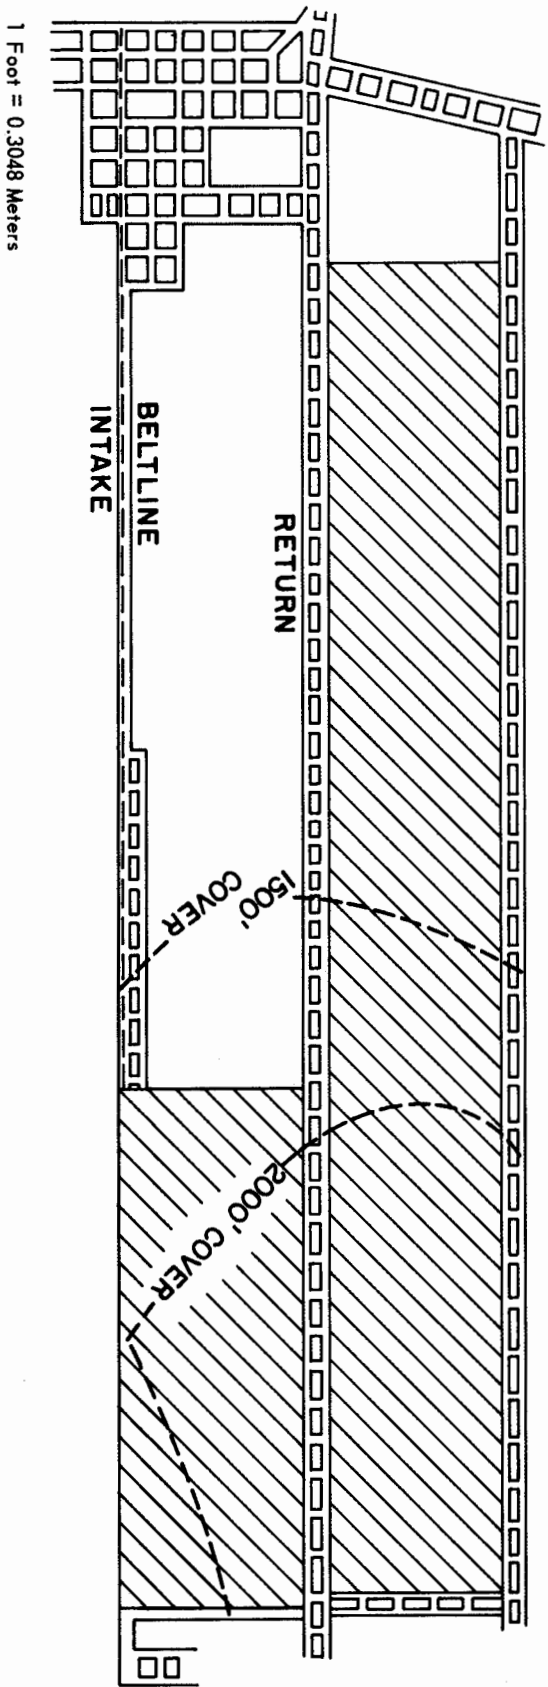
PLAN VIEW OF THE SINGLE ENTRY LONGWALL SECTION, SUNNYSIDE NO. 1 MINE
